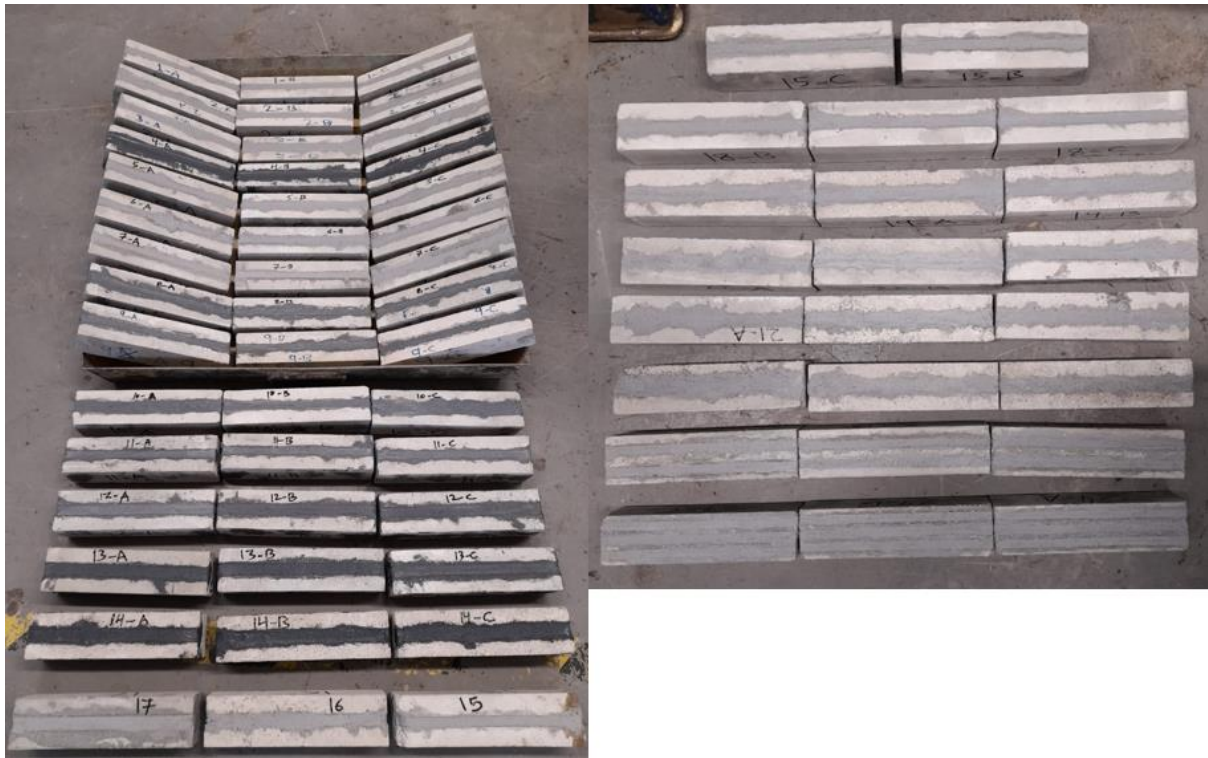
The NSM-FRP-retrofitted concrete specimens.
